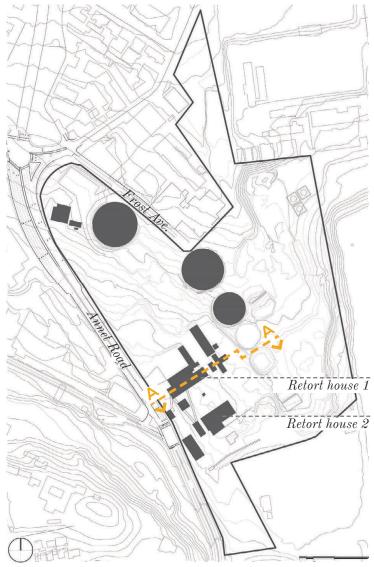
Site map showing retort house and site section position (Author 2017)
